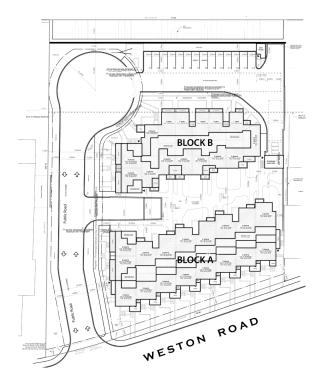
Site plan and elevation of the proposed 955 Weston Road development
